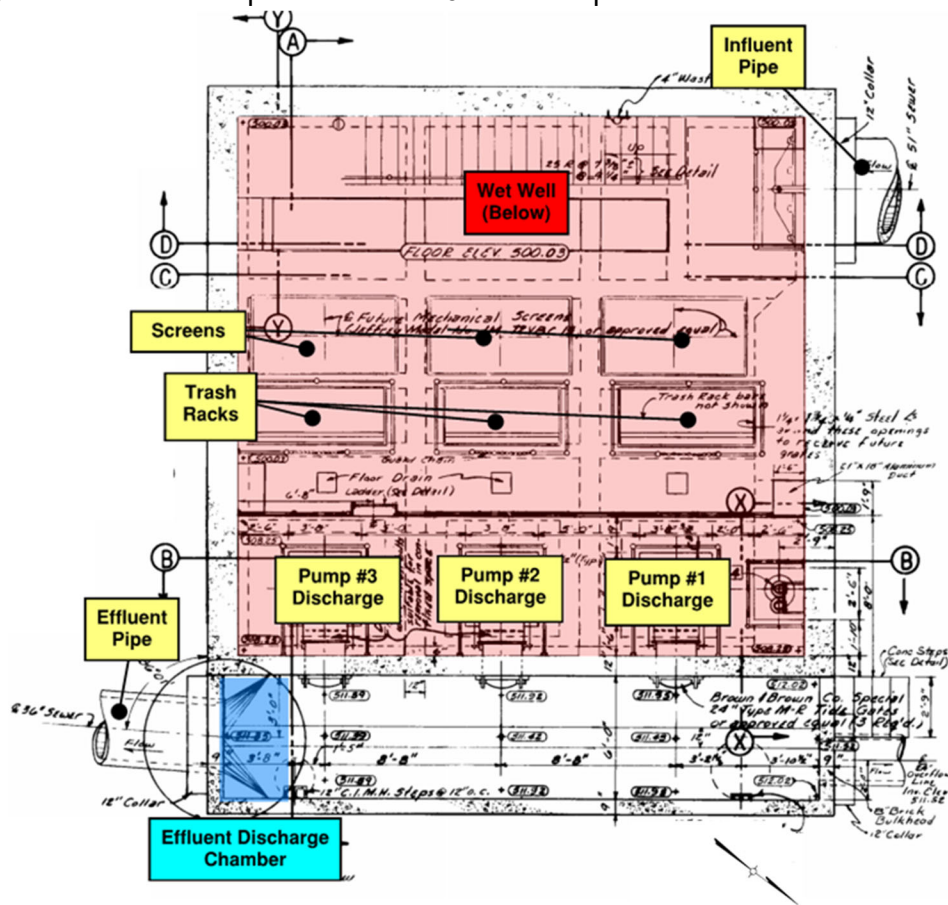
Pump Station 7 Site Layout (Adapted from 1972 Record Plans)
